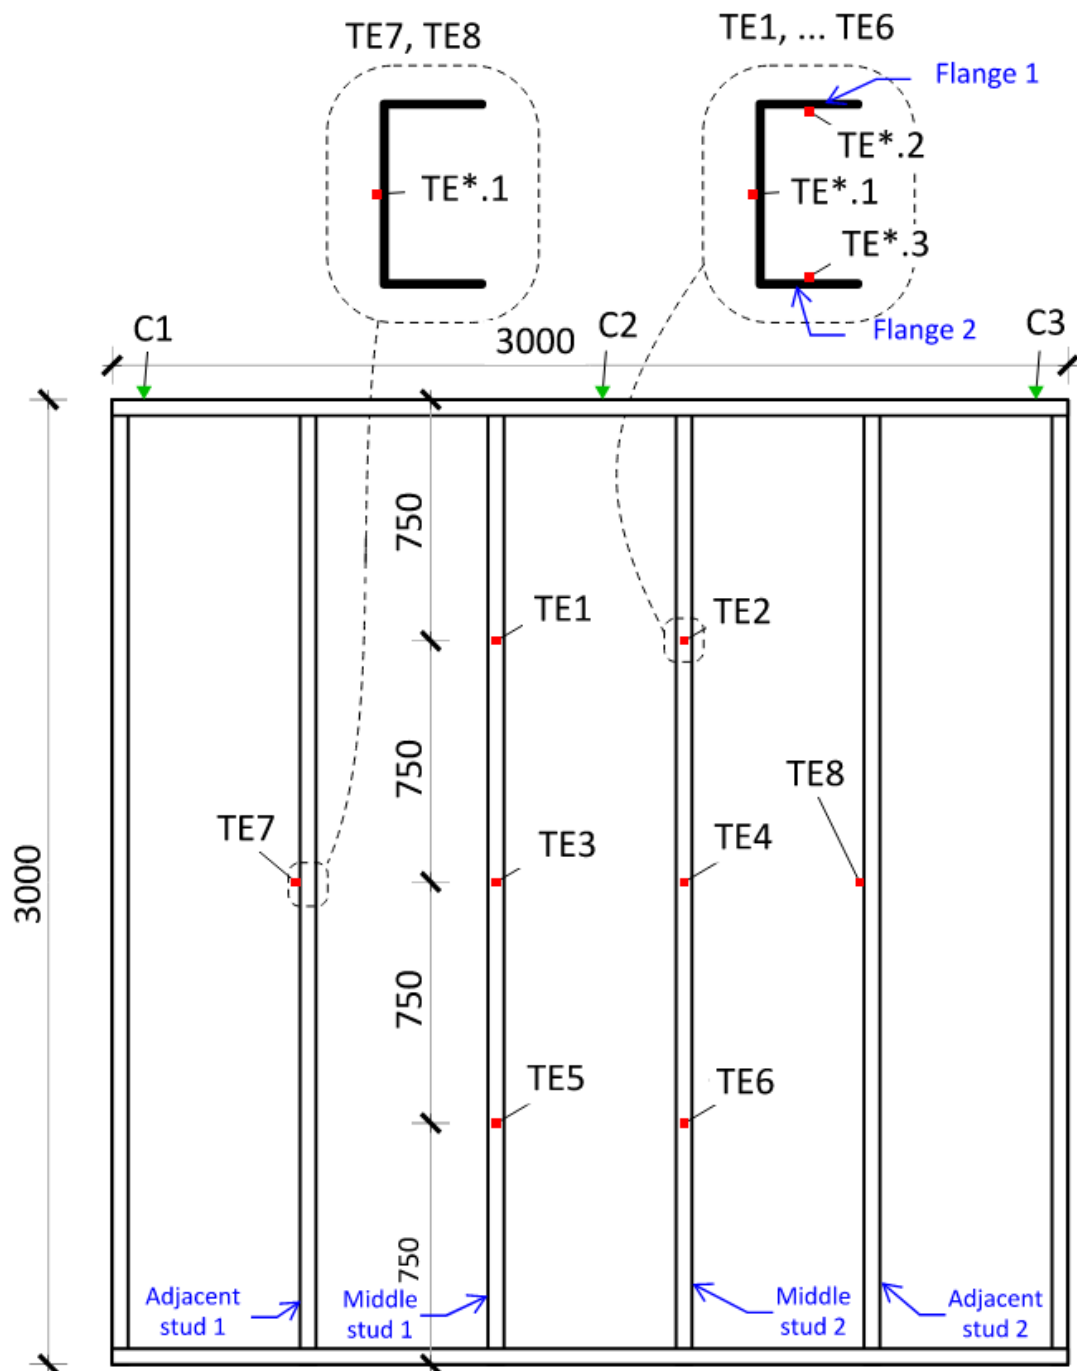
Section drawing showing location of internal thermocouples and deflection gauges
